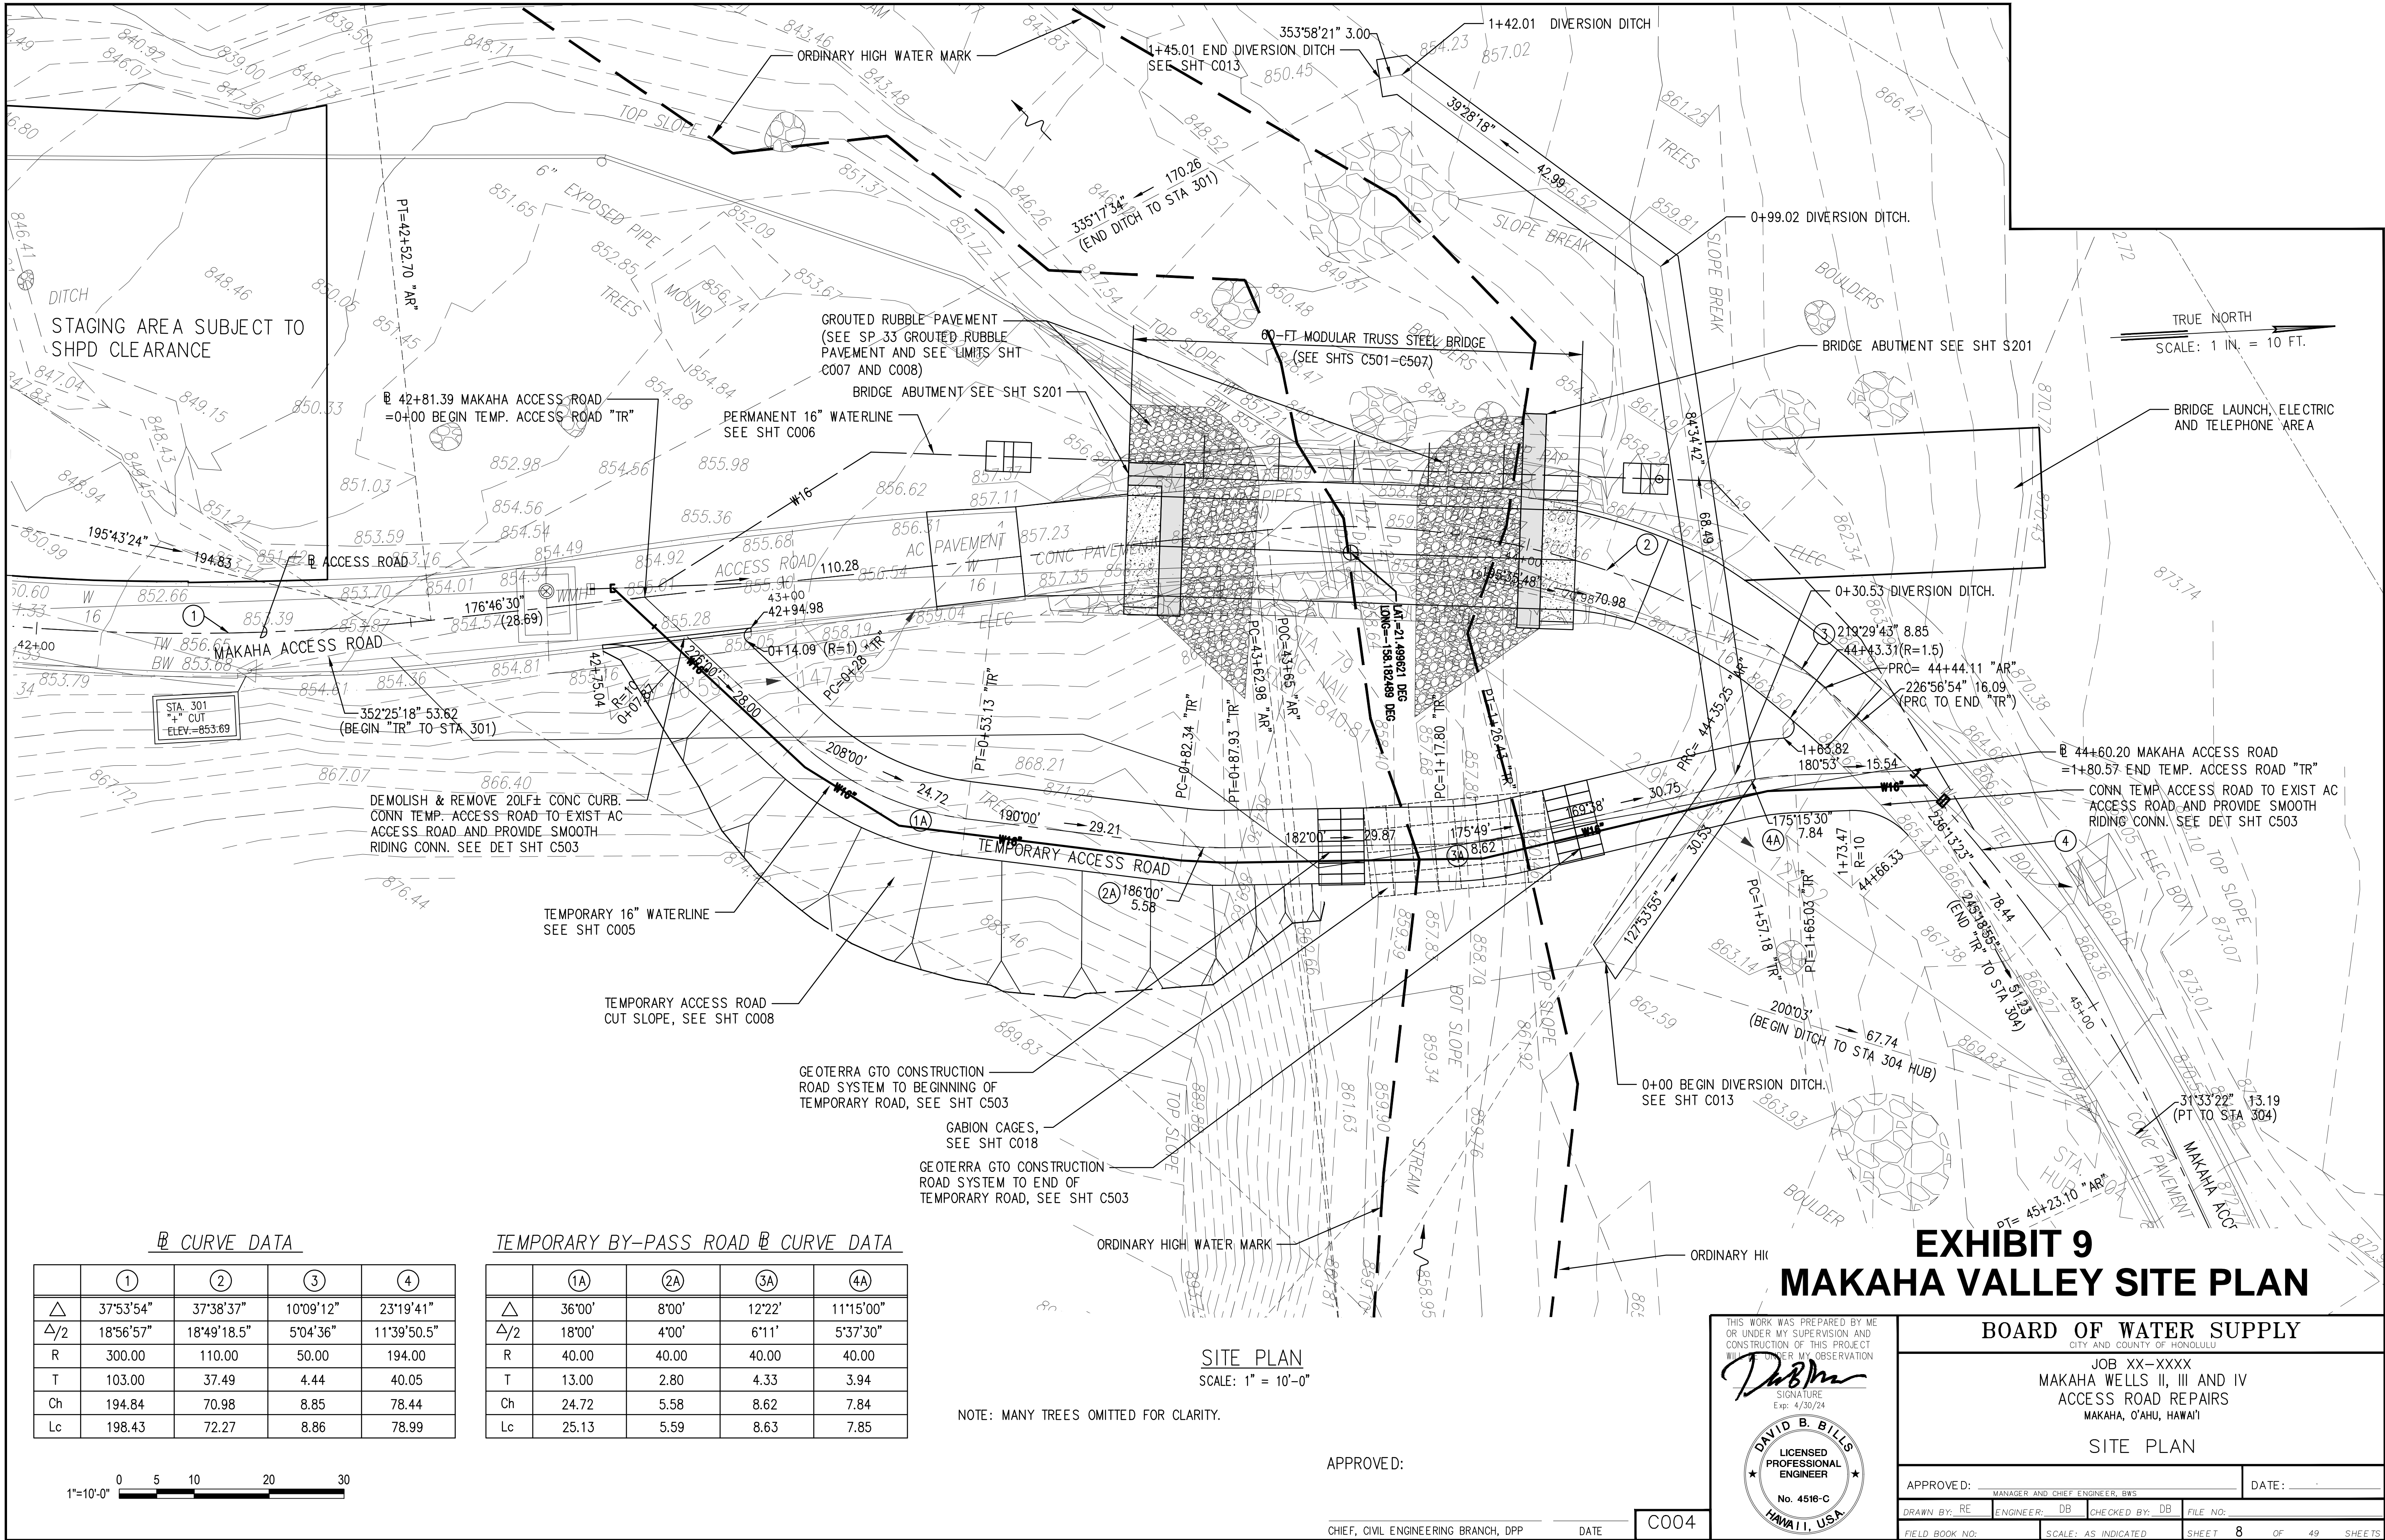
MAKAHA VALLEY SITE PLAN
